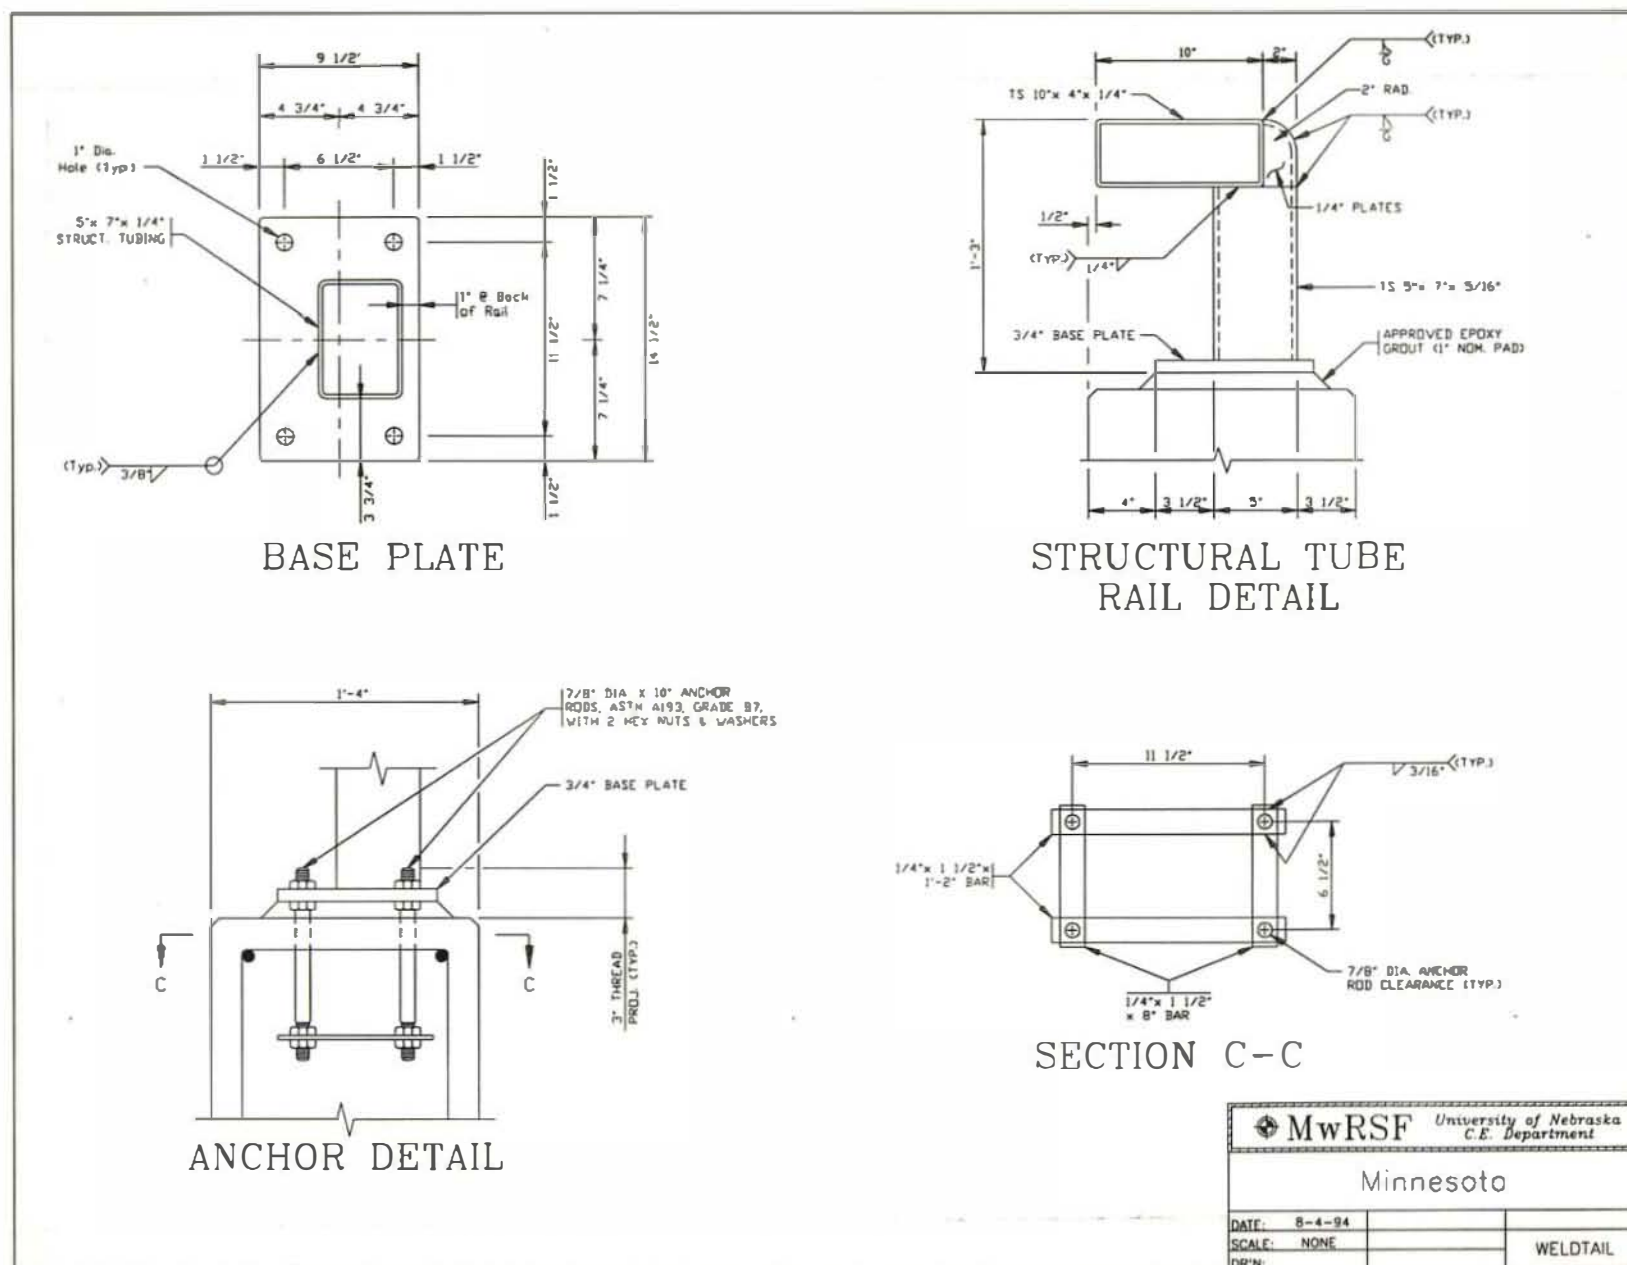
Minnesota Combination Bridge Rail Details, Design No. 3.
